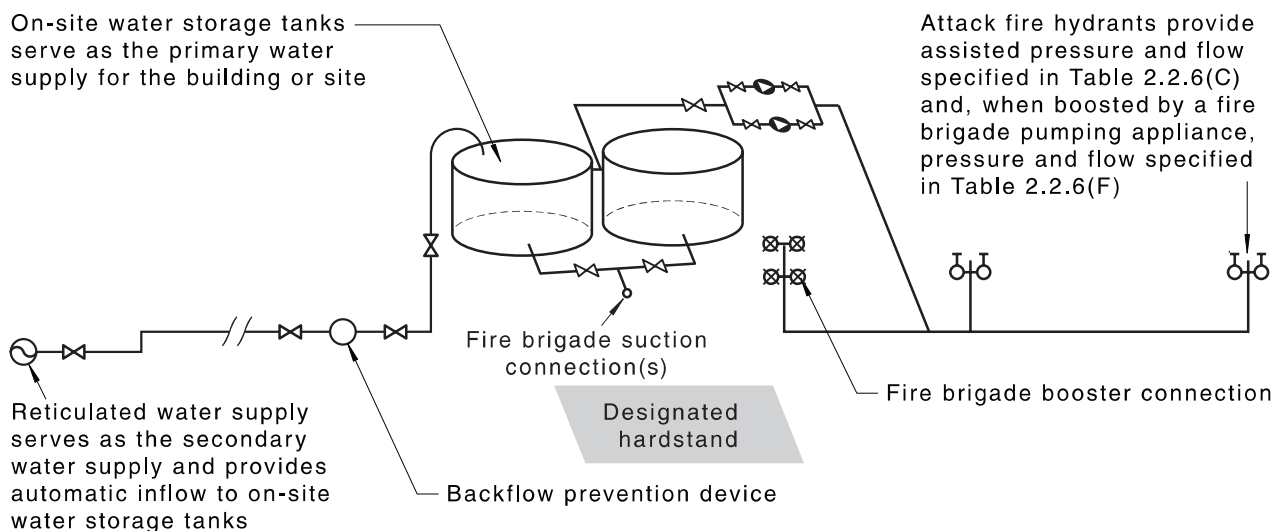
(B) — Fire hydrant system incorporating an on-site tank and pumps
